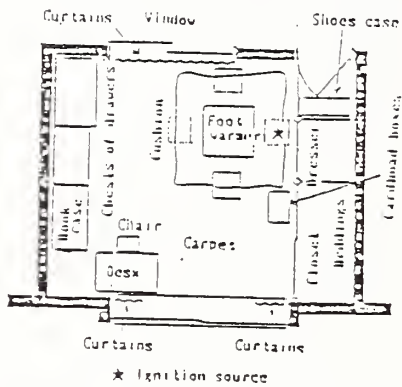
A plan view of the first floor of the building offered for fire experiments
